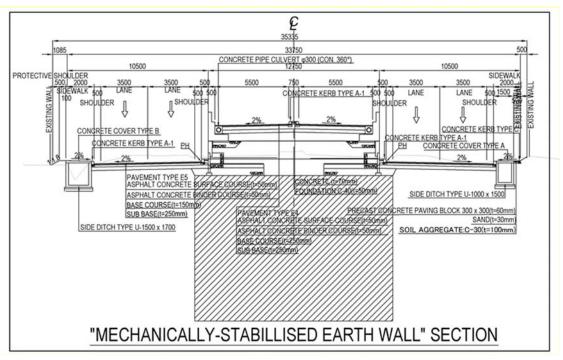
Typical Cross Section: "Near the Water Supply Office"
